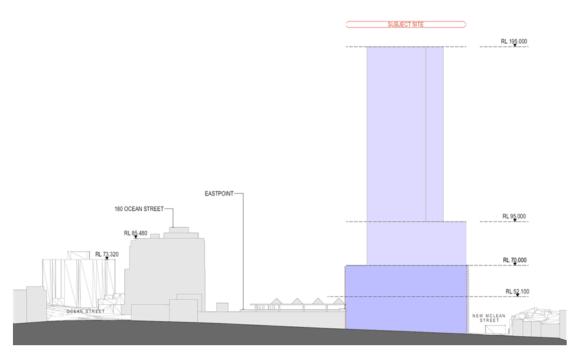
Proposed envelope (north elevation) (envelope shaded purple) Source: FJMT
